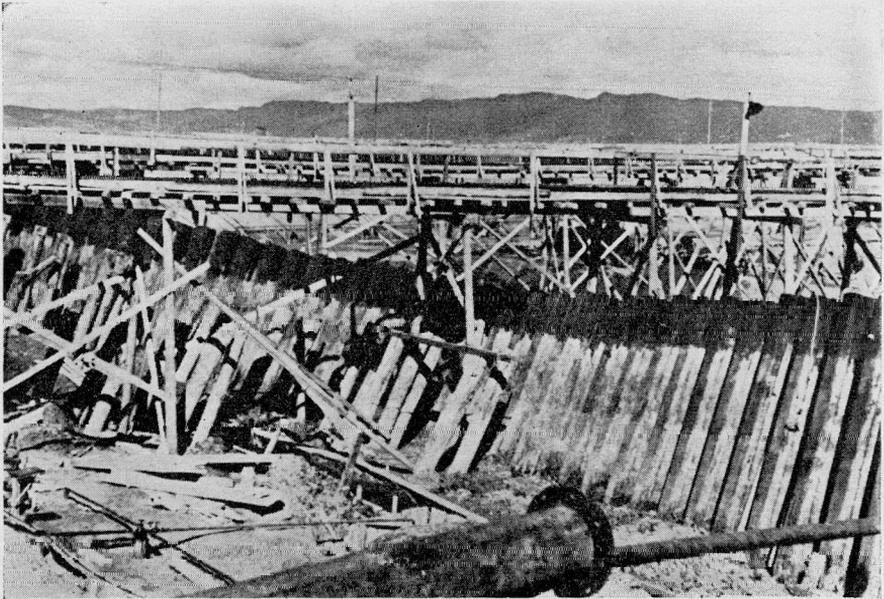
FAILURE OF SHEET PILING IN SPITE OF 65-FT. EMBEDMENT (SEE FIG. 14).
